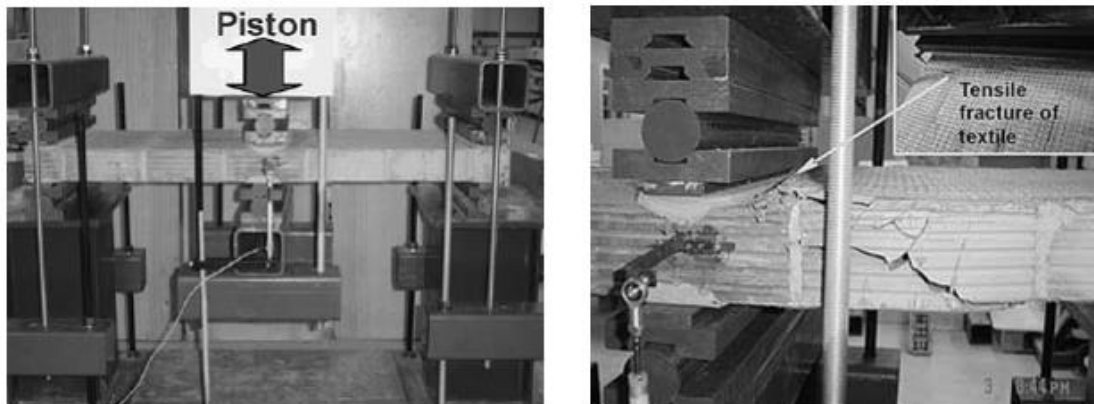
Test setup and tensile failure of the textile. (Papanicolaou et al., 2008)
